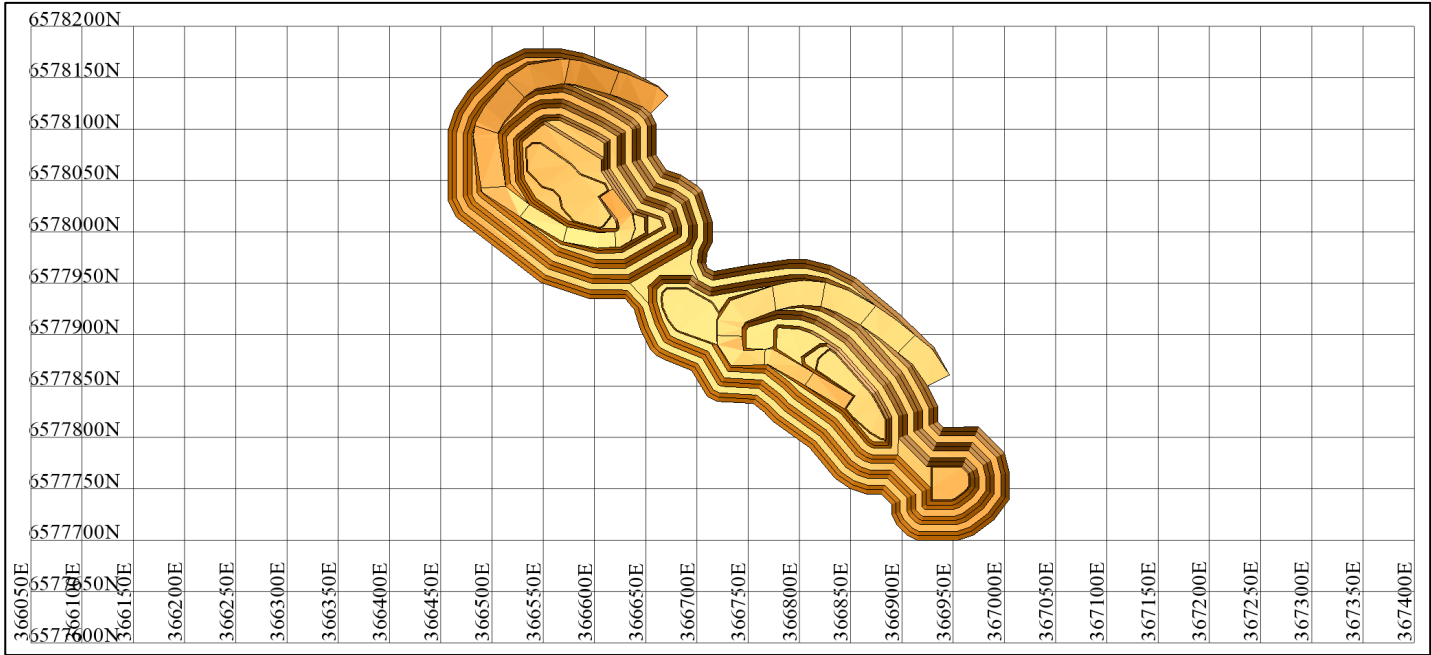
Rogan Josh pit design – Plan view - Reserve Case
